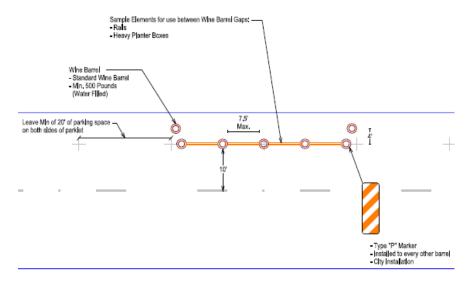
Typical layout plan for a 2-parallel parking stall wine barrel parklet on State Street
